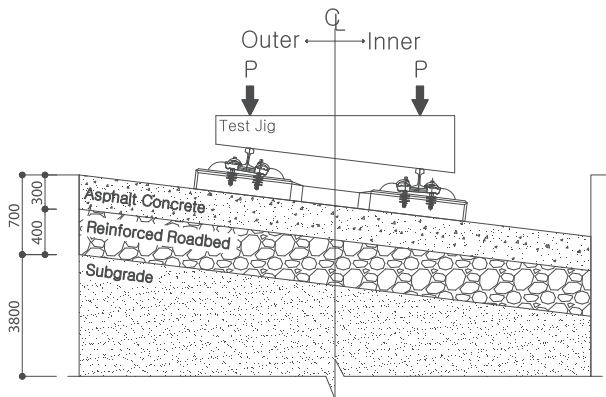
Schematic diagram of test track constructed with cant (unit: mm).
